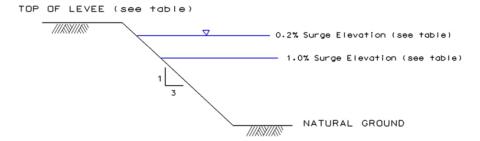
Typical Levee Design Cross-Section (RM 82E – RM 91E) – Plaquemines/St. Bernard Parish East Bank
